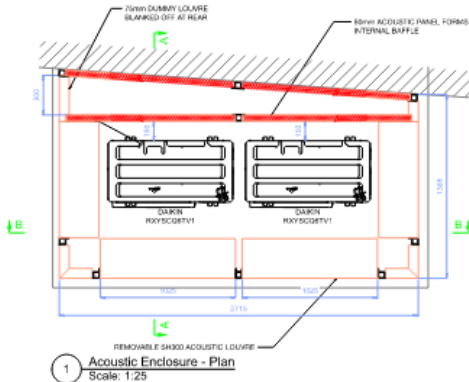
(above): Proposed acoustic enclosure (Source: Proposed drawings)
